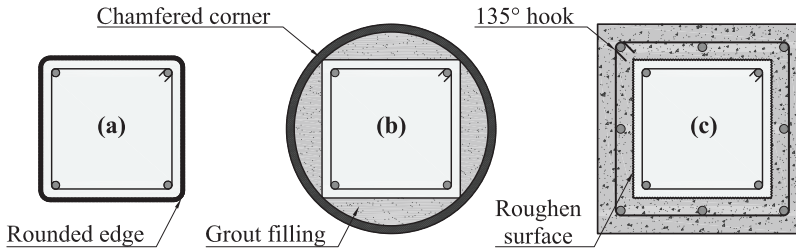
Typical cross sections of a column retrofitted using (a) FRP, (b) steel, and (c) RC jacketing.
